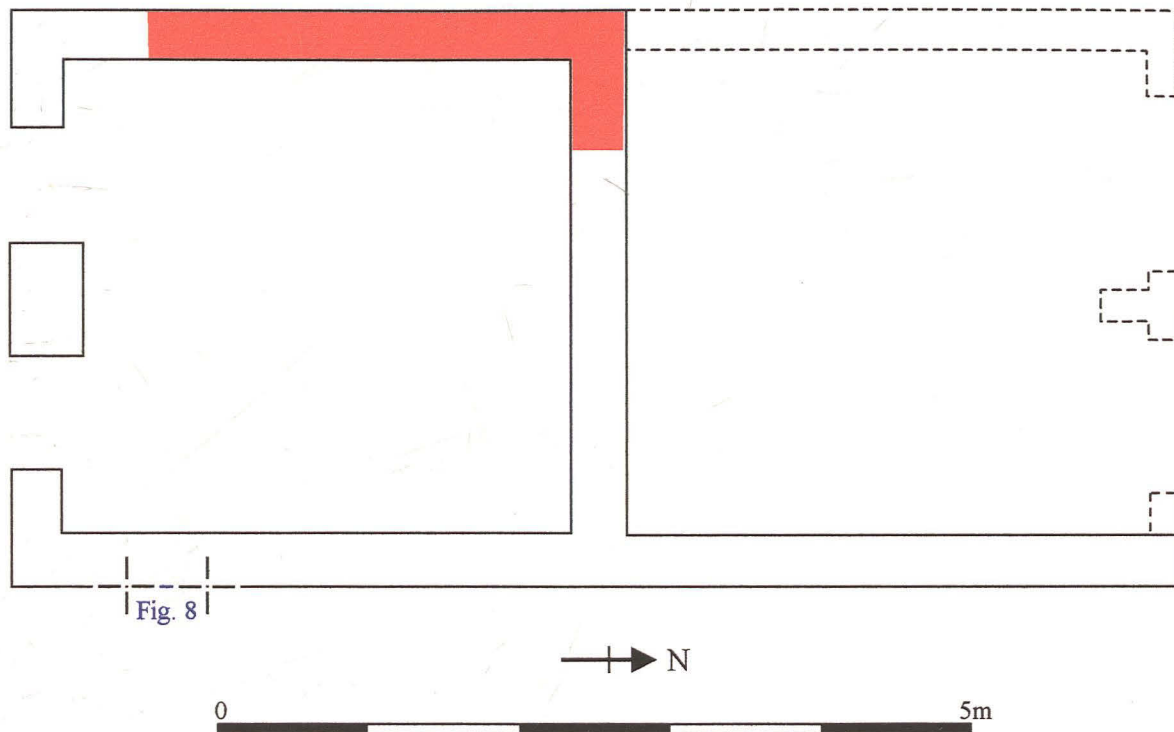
Plan showing the plot 2/3 shared garage. The solid line denotes the foundation trenches excavated before fuel tanks were discovered in the red highlighted area. The dotted outline shows the full extent of the garages (not excavated). Scale 1:100
